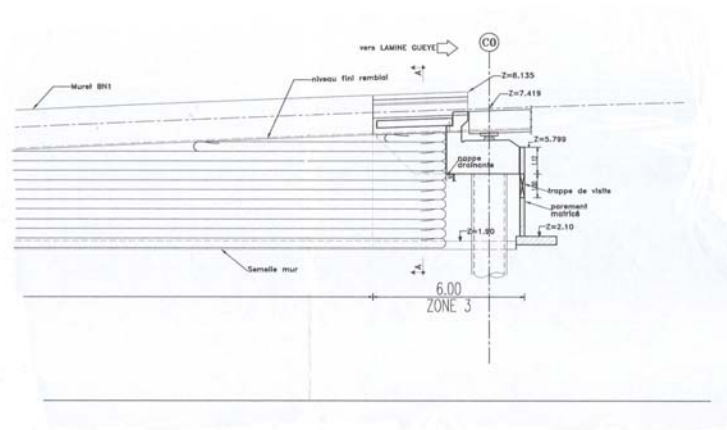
Partial longitudinal cross section near abutment C0 – « Malick SY »
